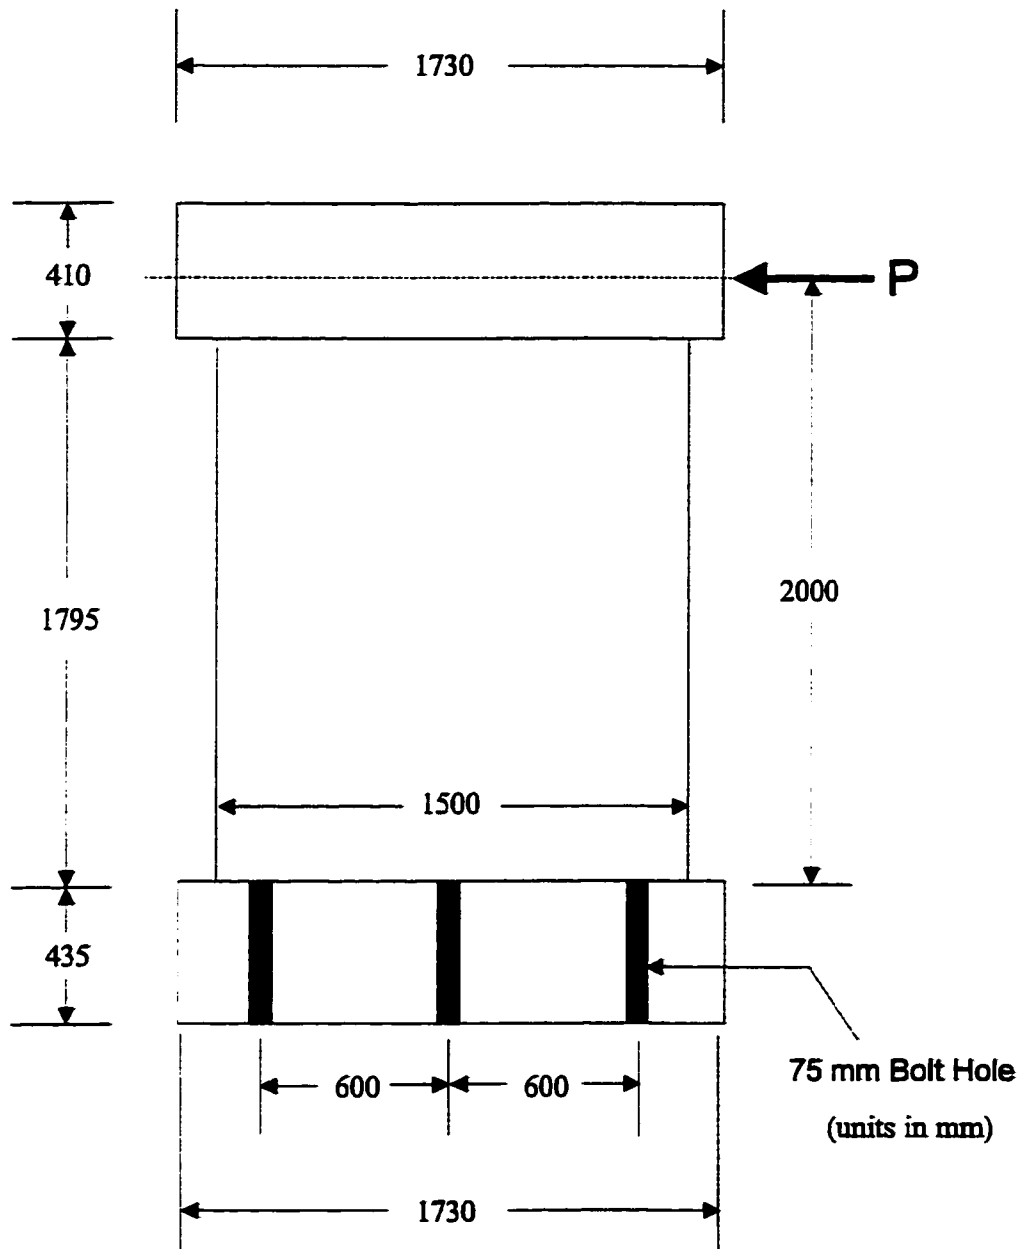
Side view of a reinforced concrete shear wall test specimen
